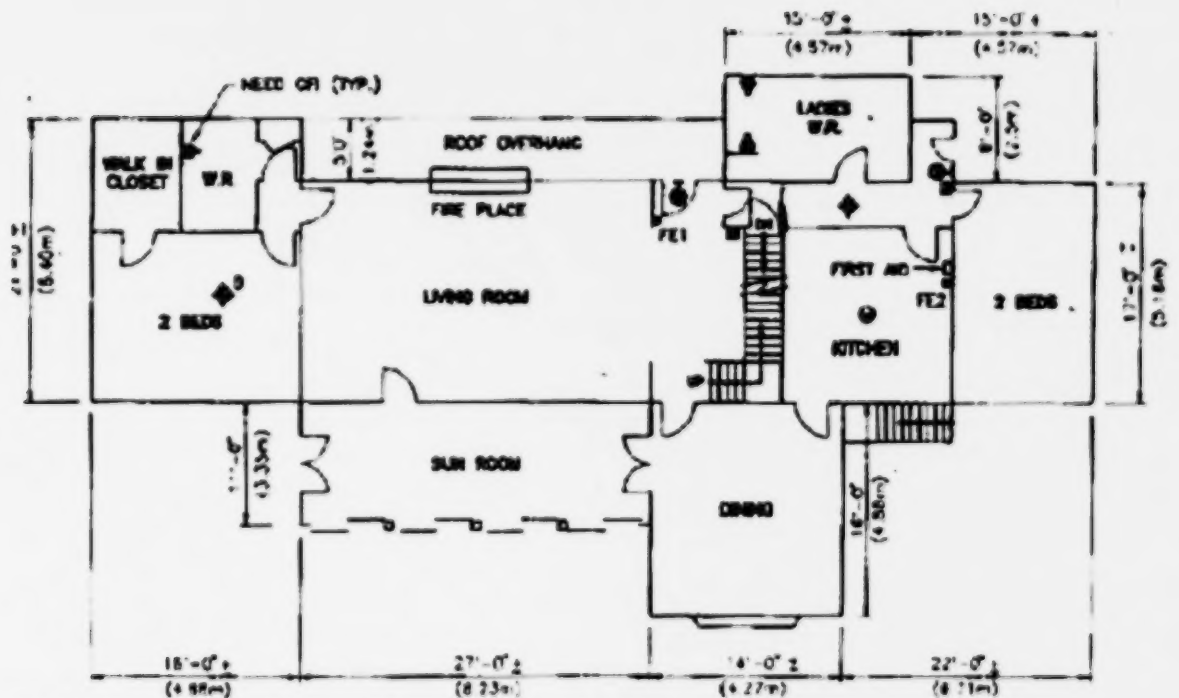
STONEHEDGE GROUND FLOOR PLAN
